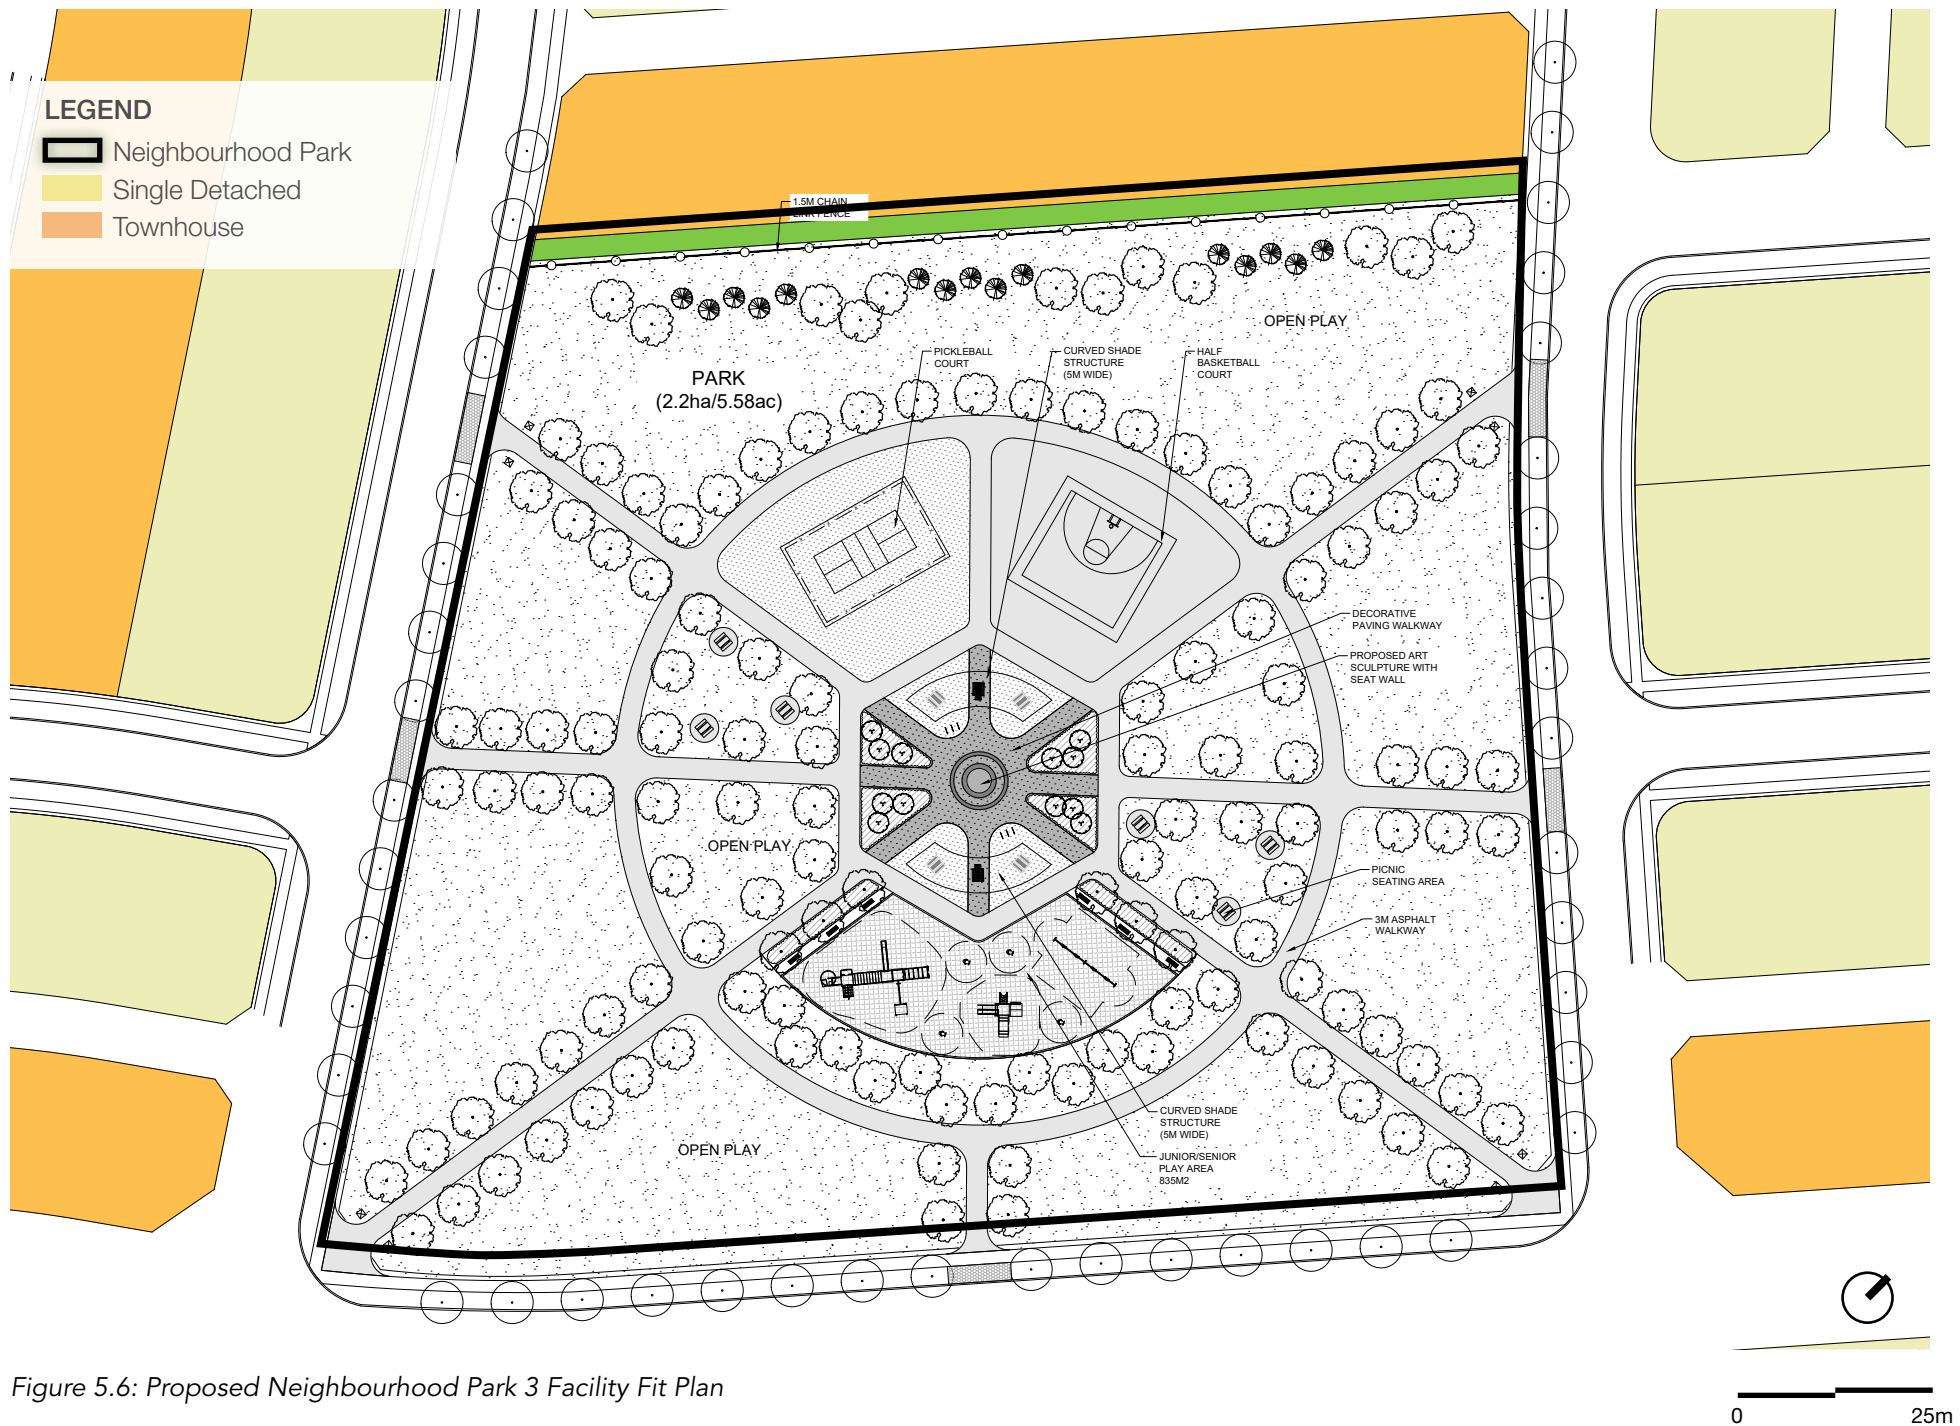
Proposed Neighbourhood Park 3 Facility Fit Plan
